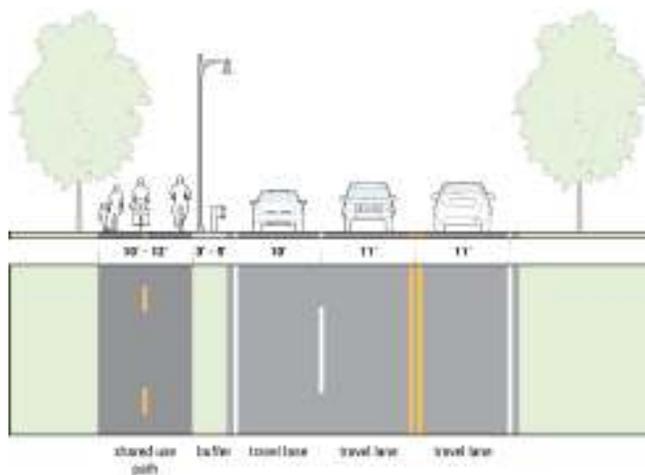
Hammond Pond Parkway Segment 3 Long-term with Three Lane Cross Section
